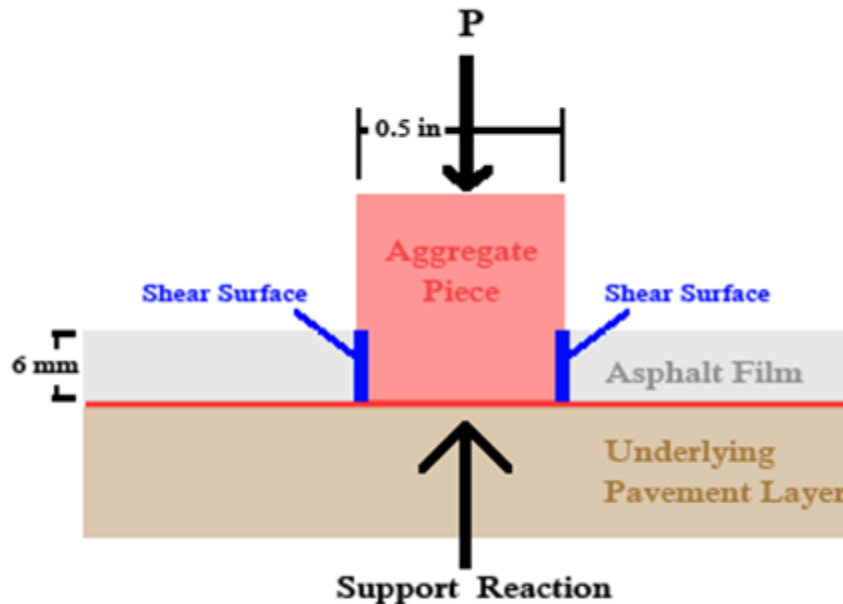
Schematic Showing Loaded Seal Coat Aggregate Piece.
